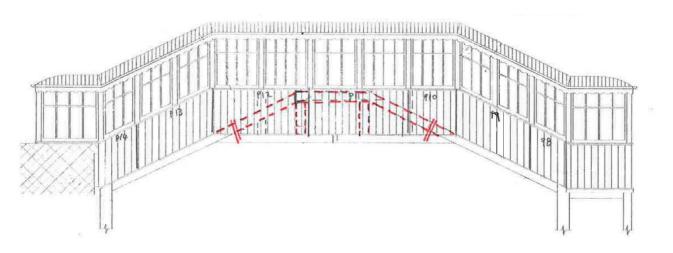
Believed structural form of Alton Footbridge from photos and video evidence
